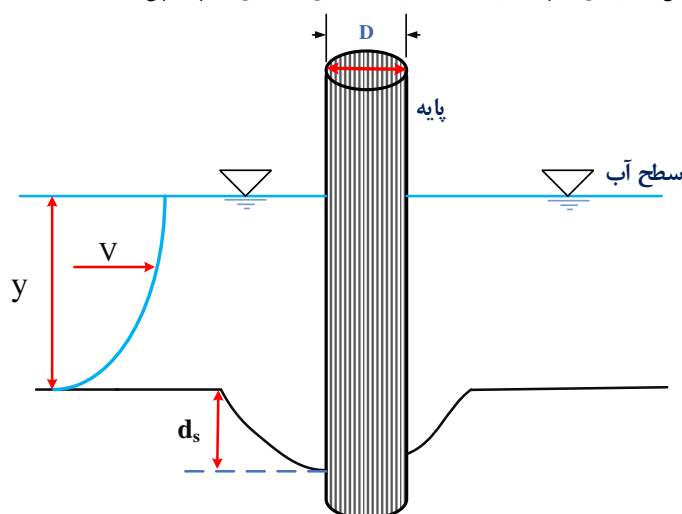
Some Influential Parameters on Local Scour around Bridge Pier
